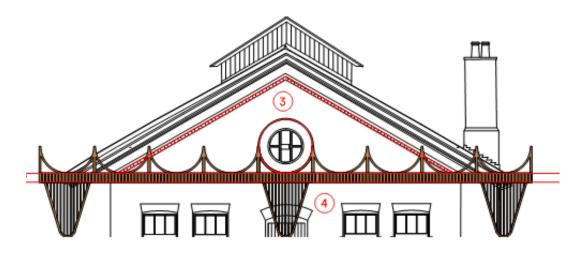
Diagram of Horse Hospital gable elevation and proposed canopy in front.
